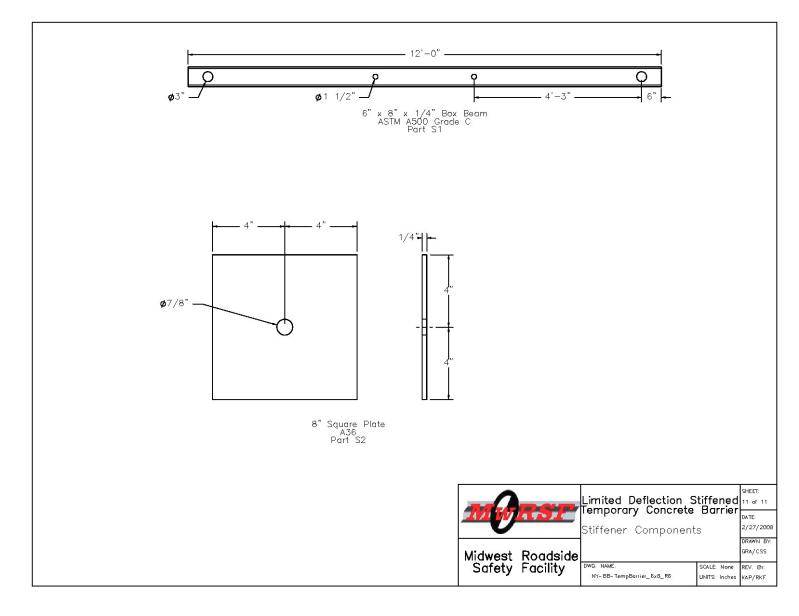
Box Beam Stiffener Details (English), Test NYTCB-3
